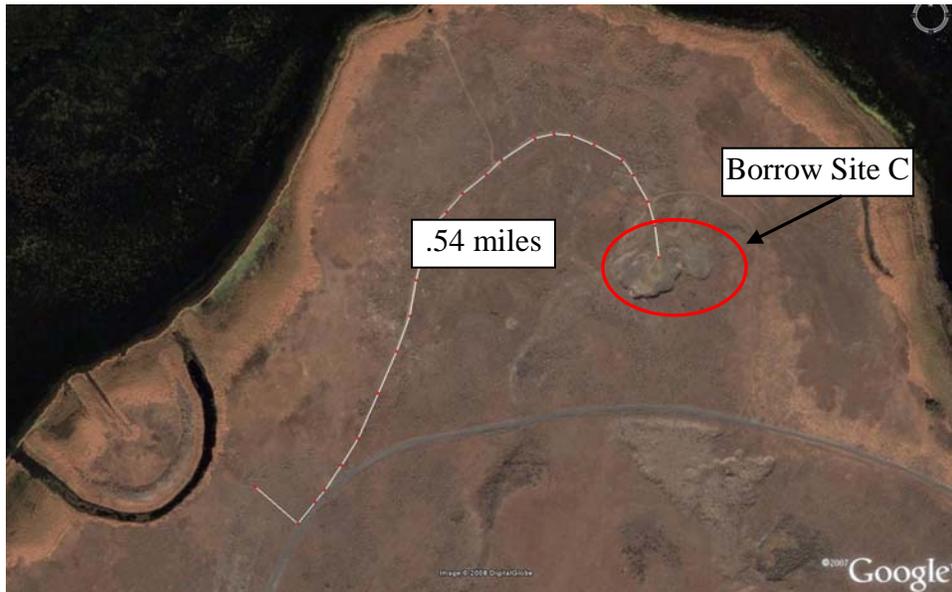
Aerial photo of Borrow Site C with potential access road from staging area.
